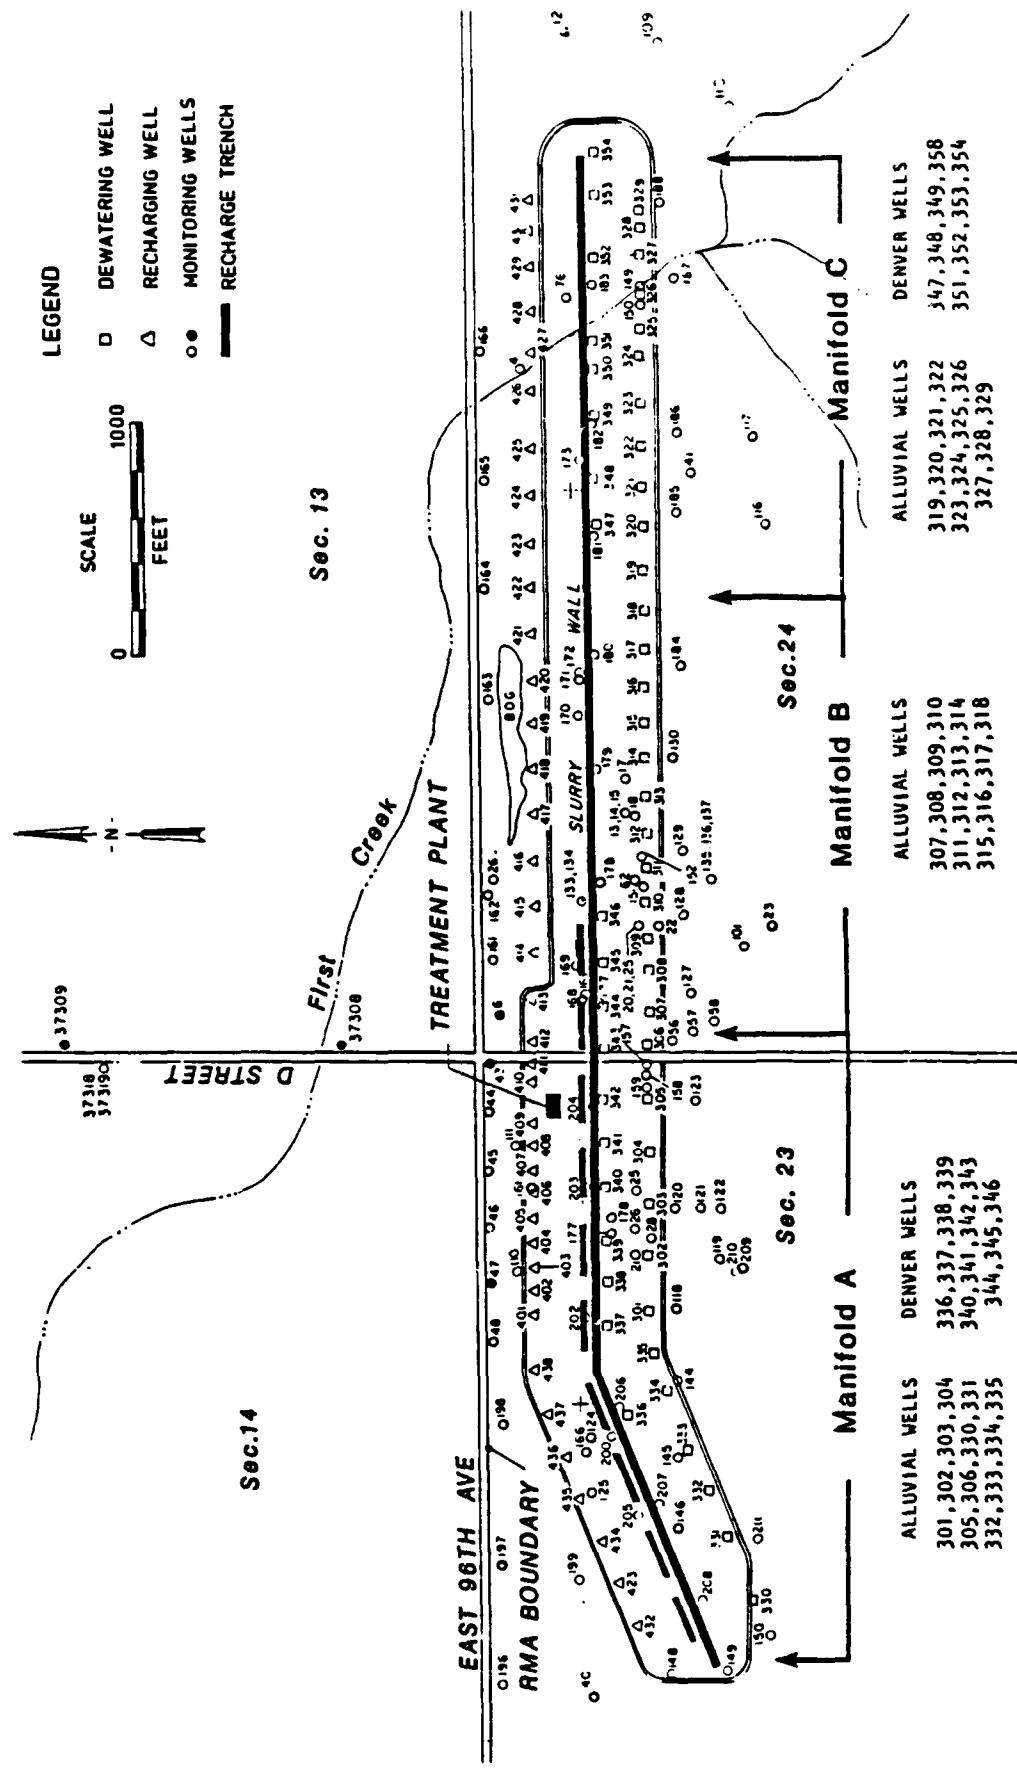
Slurry Wall barrier and recharge trench system at North Boundary.
